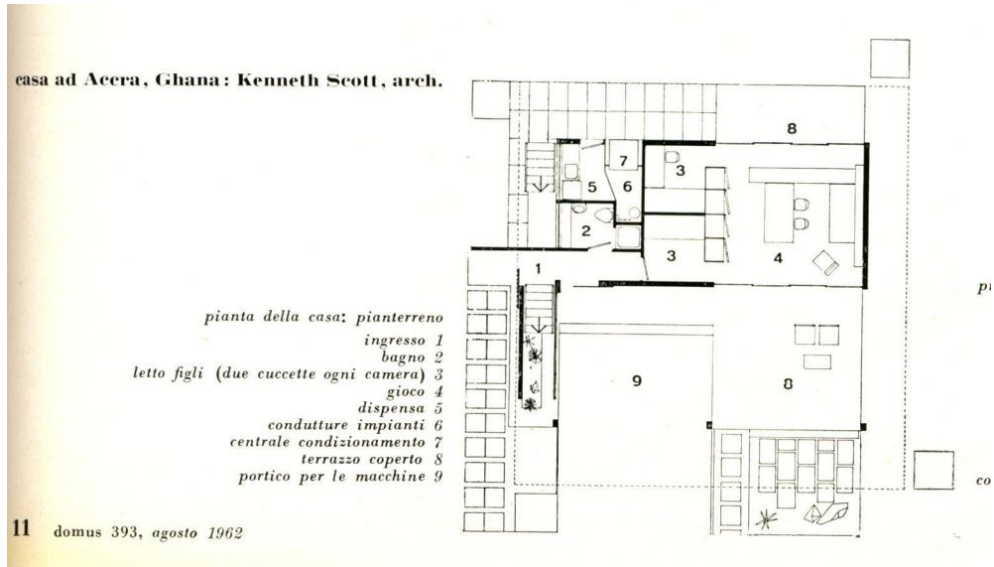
Ground Floor Plan of the Scott House, Accra, 1961²⁷⁹
